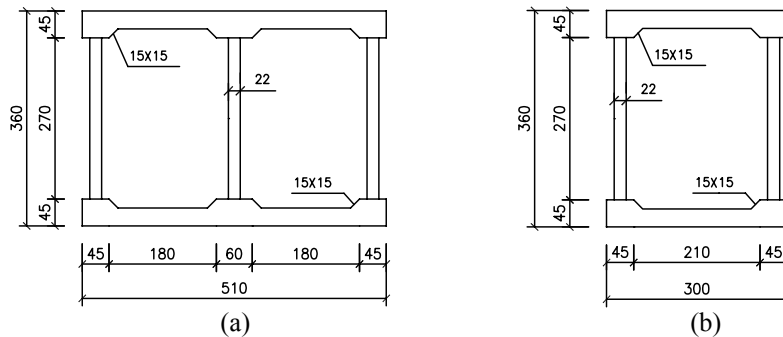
Cross section of tied beam with corrugated steel webs (unit: cm): (a) Center tied beam, (b) Side tied beam
